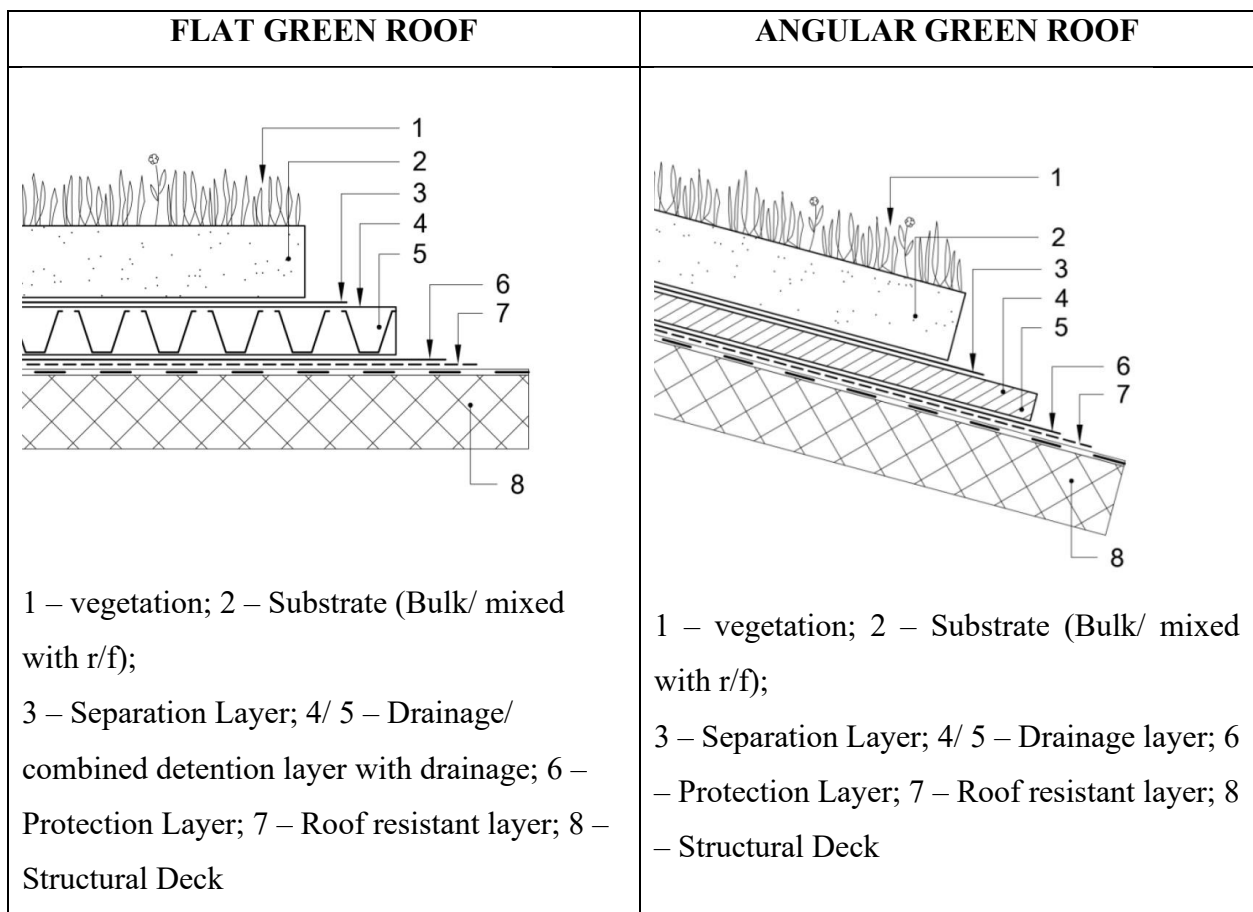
Typical configuration for flat and sloped extensive green roofs (Johannessen, et al., 2018)
